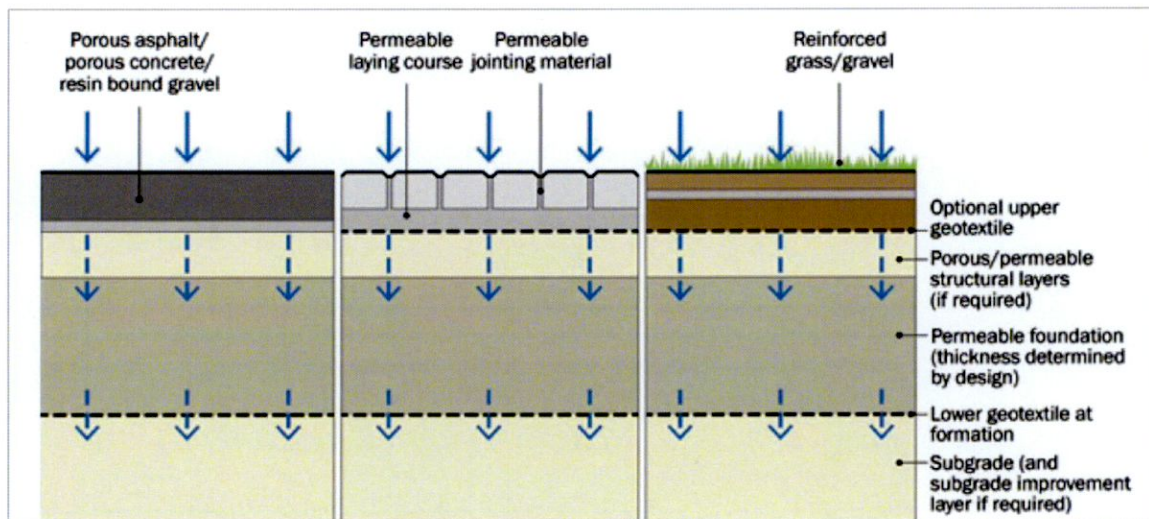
Typical pervious/permeable pavement buildup details.
